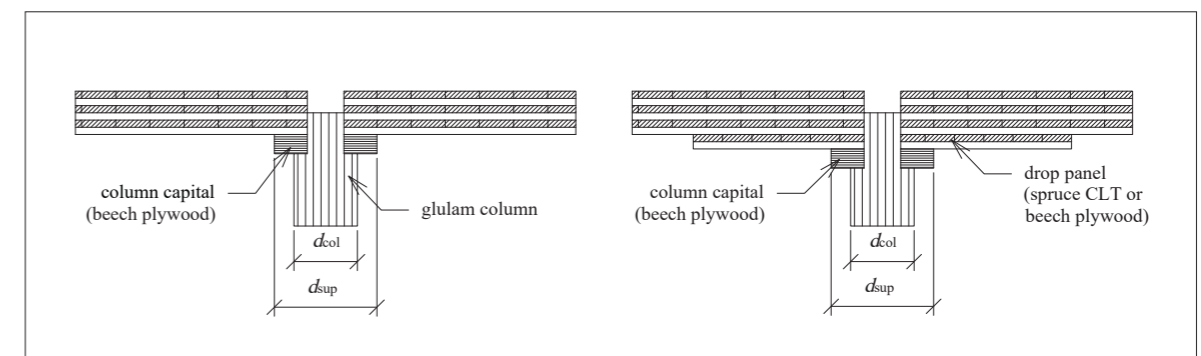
Section through locally reinforced column-slab connections (MUSTER 2021)
